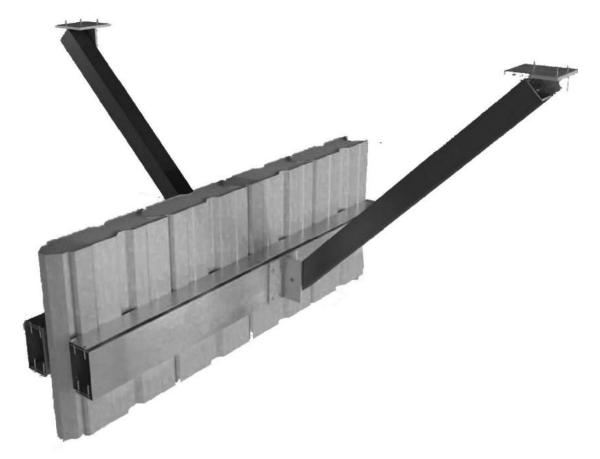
Example of unprotected lateral bracing on both sides of wall
